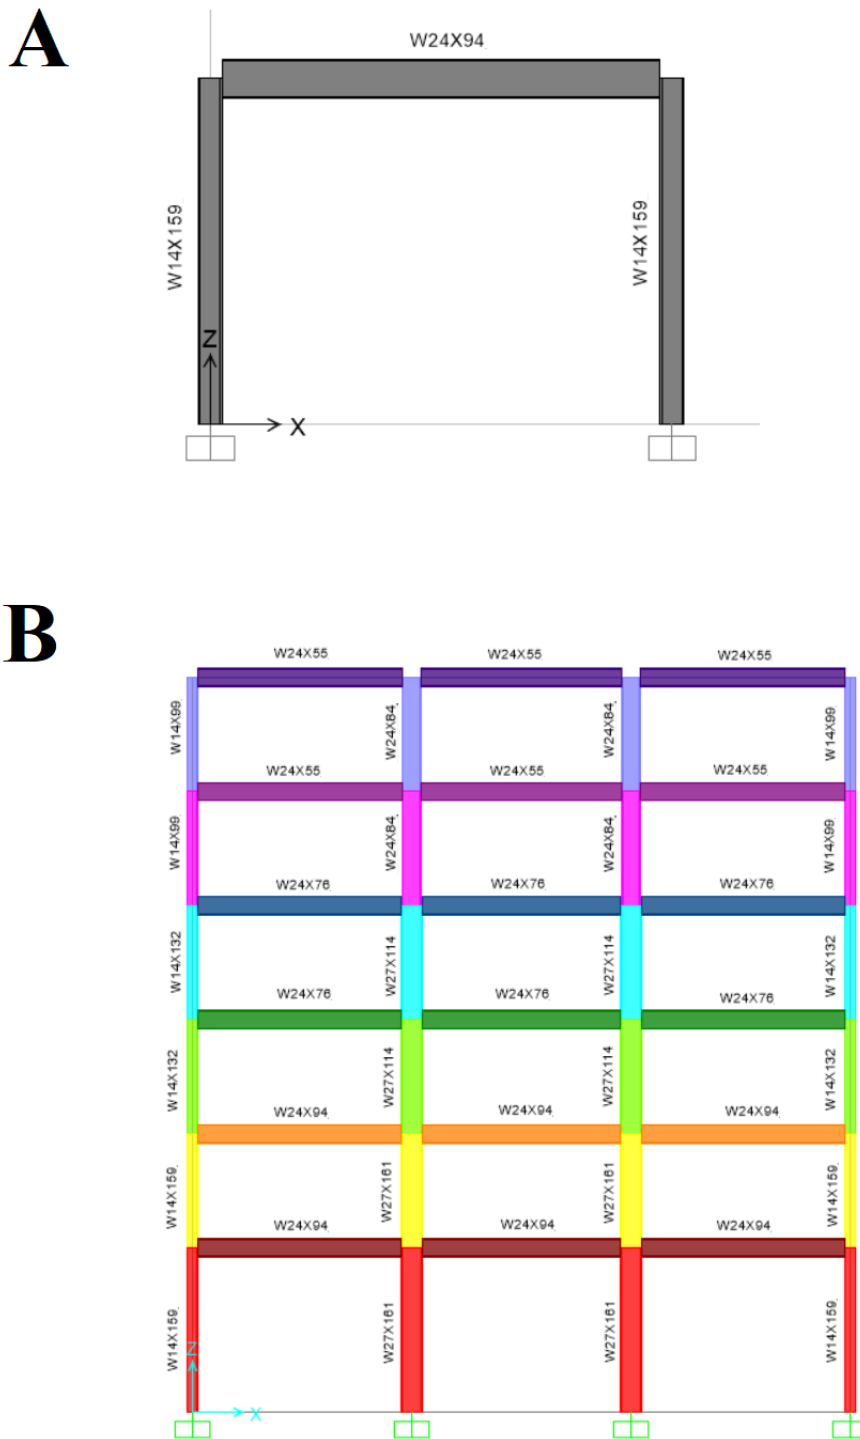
The two steel moment frame structures (plotted using the SAP2000 interface) (A) One-story Steel Frame Model. (B) Six-story Steel Frame Model. The I-beam sections assigned to each element are also displayed.
